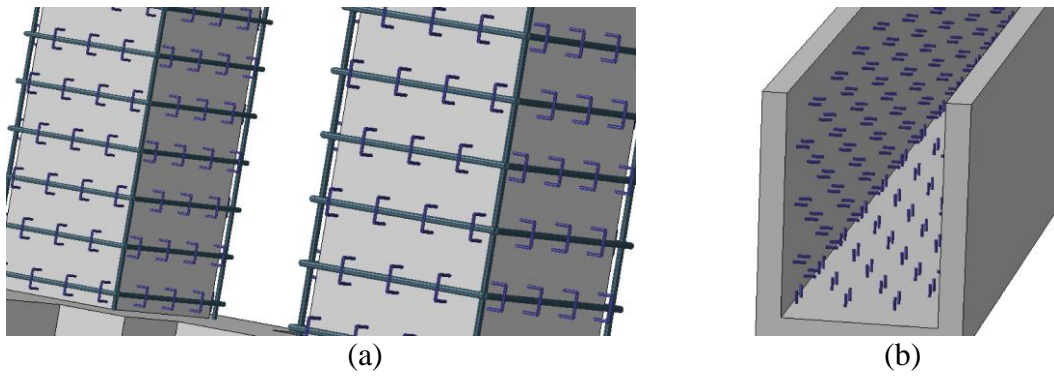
Application of Π shaped shear links. (a) on columns; and (b) on RC formwork.
